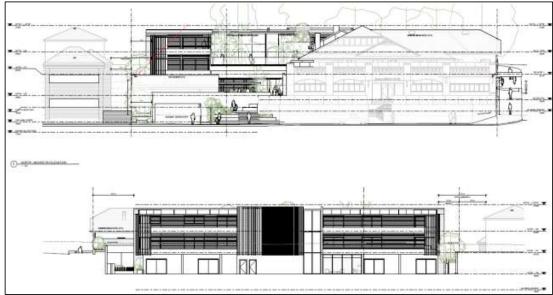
Excerpt from architectural plans; Indicative north and south elevations.
